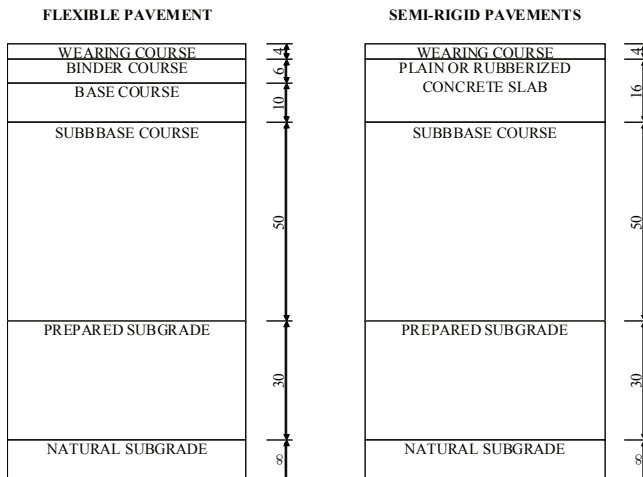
Cross-sections of the taxiway flexible and semi-rigid pavements (dimensions in cm)
